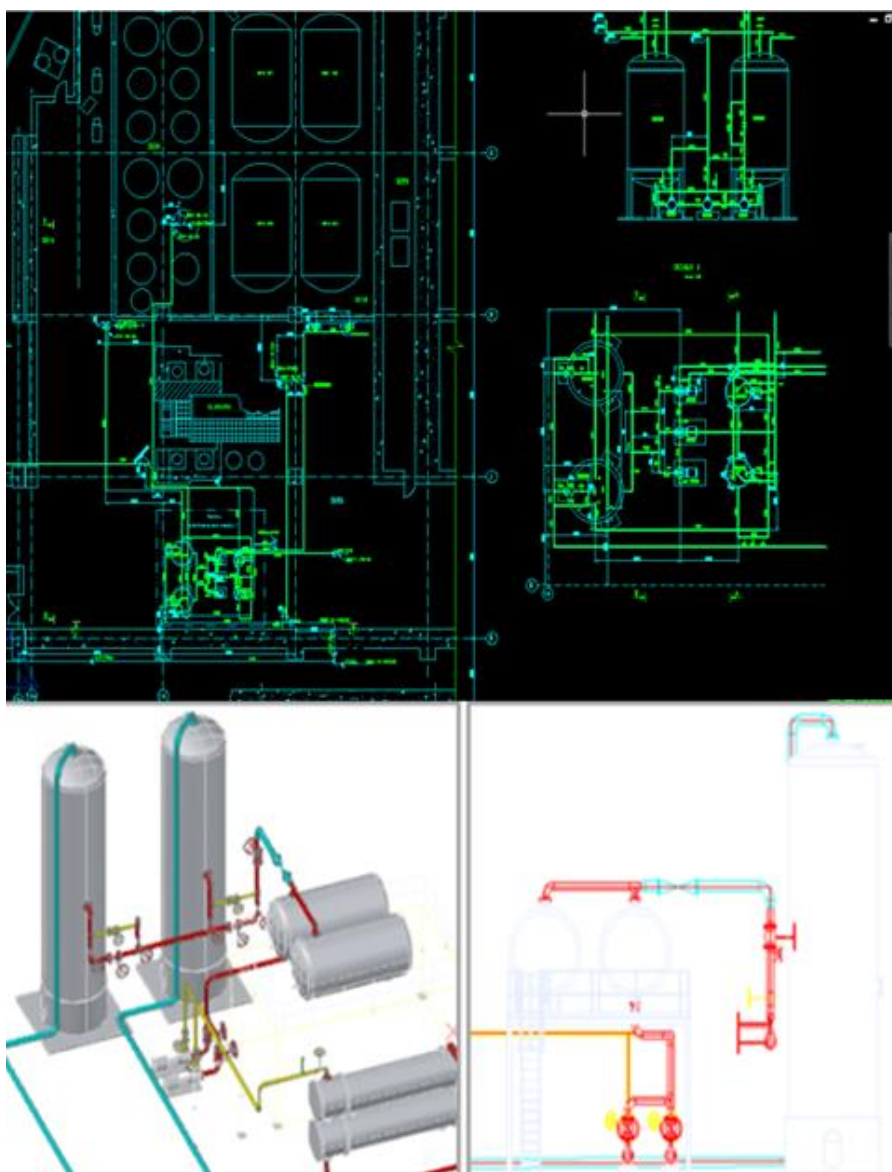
Plan, section and detail views, corresponding to the technological system configuration
